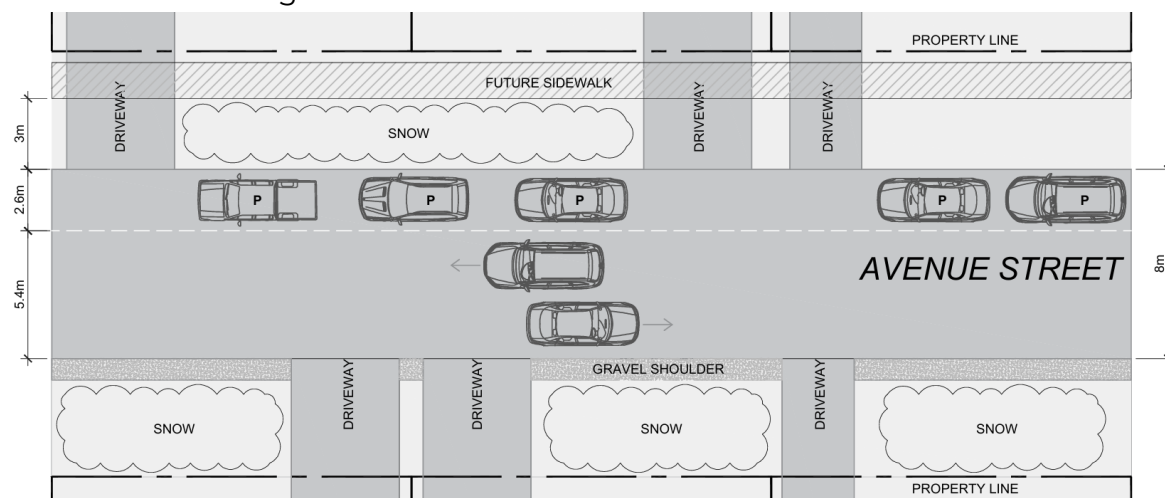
Street permit parking on one side of an 8m wide street and a future sidewalk.
